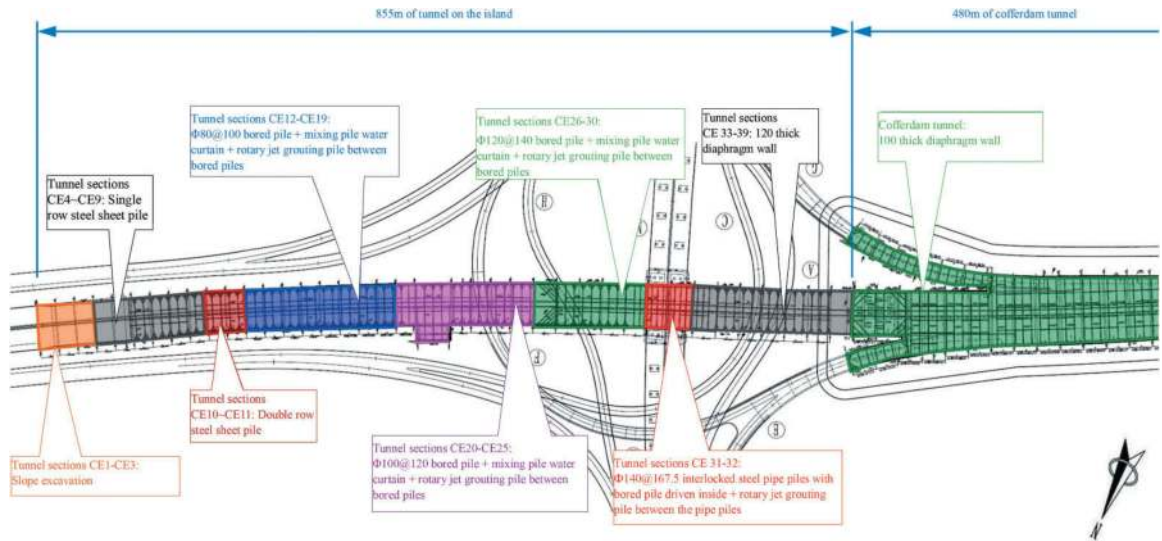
Layout of tunnel retaining structure on the island (dimension unit of retaining structure indicated in the figure: cm).
